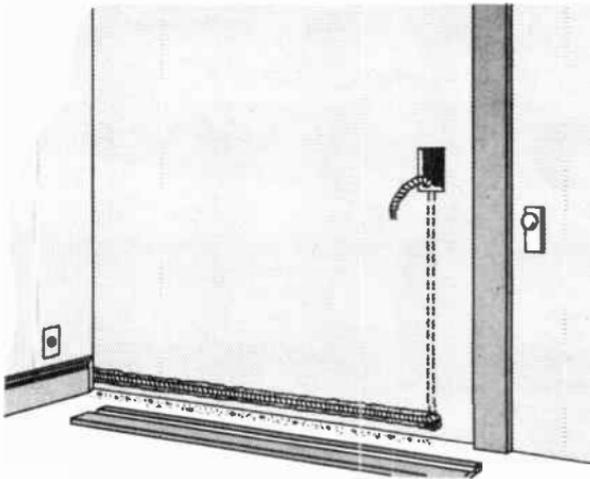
How armored cable can be used for making an electrical extension without damaging the visible plaster.
